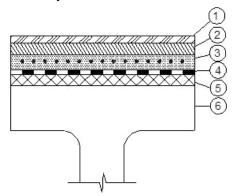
The traditional design of the bridge deck of the carriageway with the device of gluing or coating waterproofing: 1-top layer of asphalt concrete pavement; 2 - lower layer of
